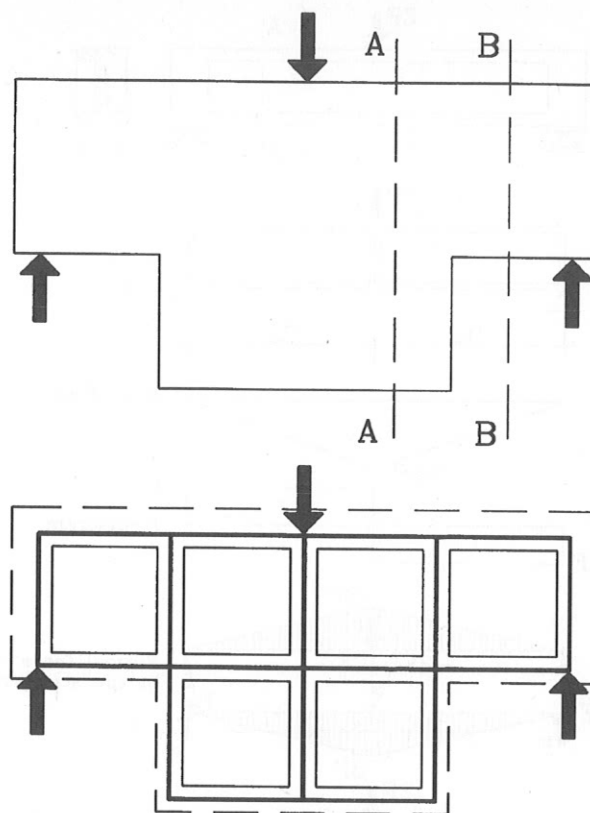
Wall-type deep beam modeled with stringers and panels; position of stringers and panels must be judiciously determined
